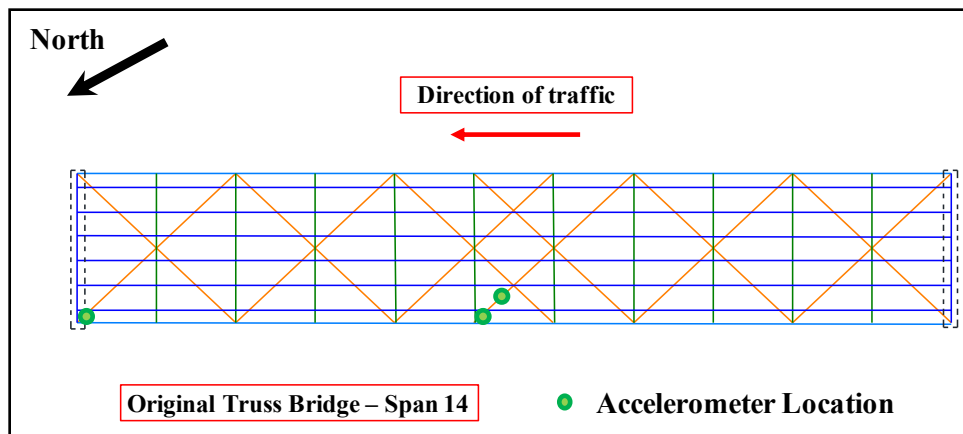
Accelerometer locations at Span 14 of Bridge E
